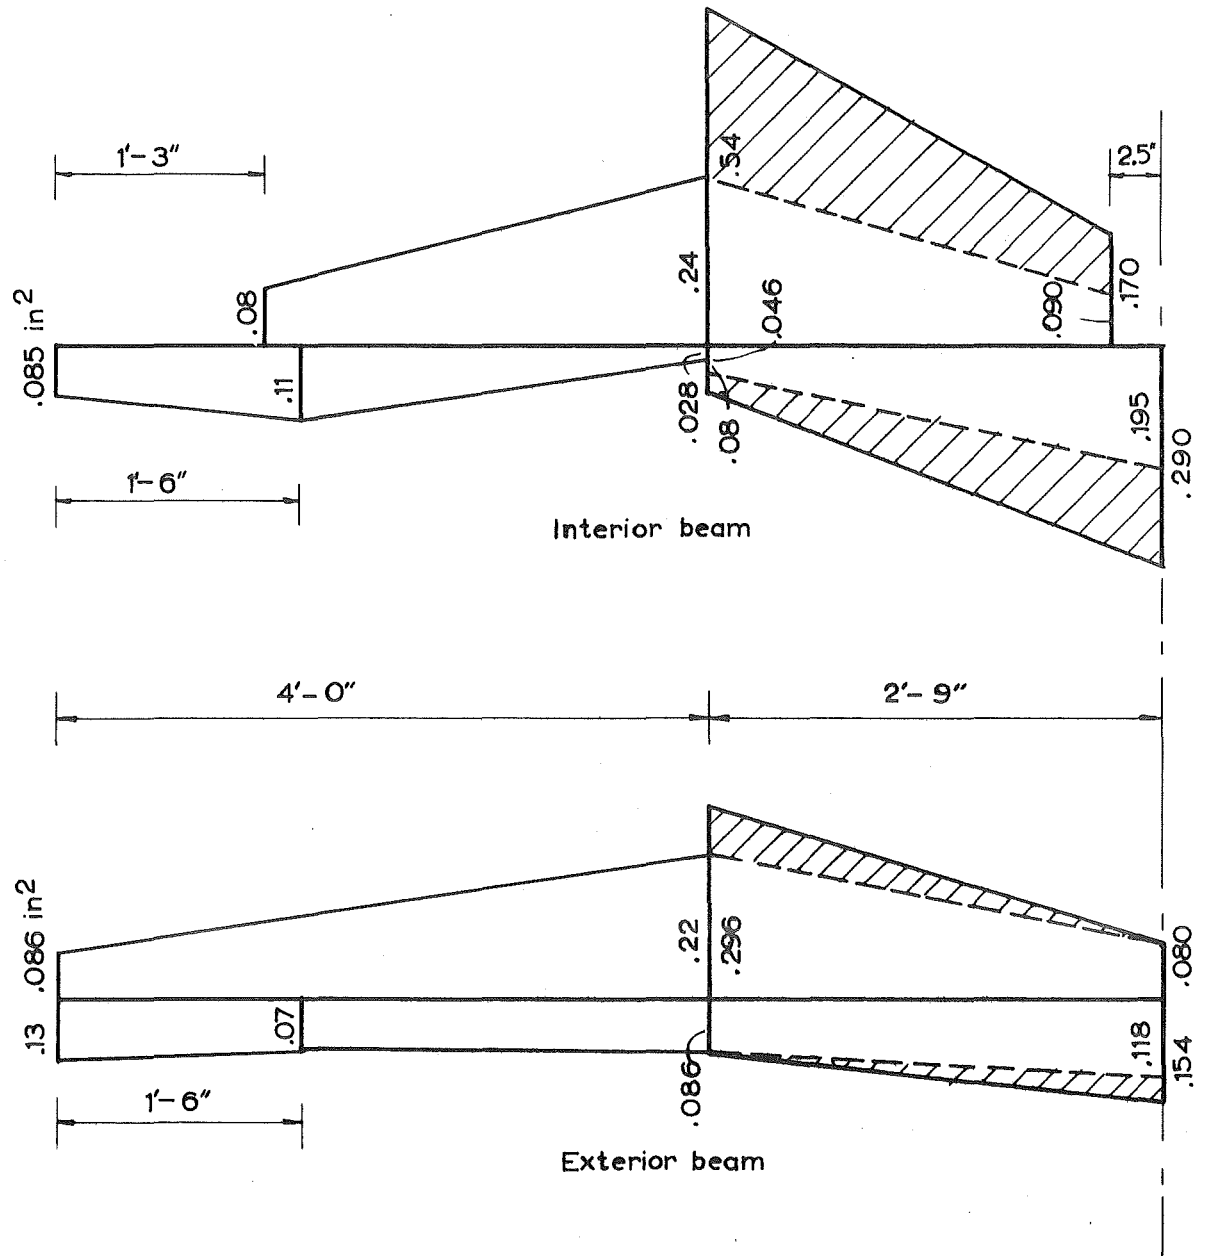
LONGITUDINAL STEEL IN BEAMS
